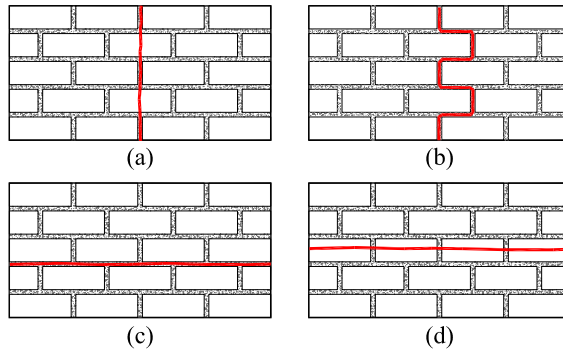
Mechanism of failure of masonry subjected to direct tension.
